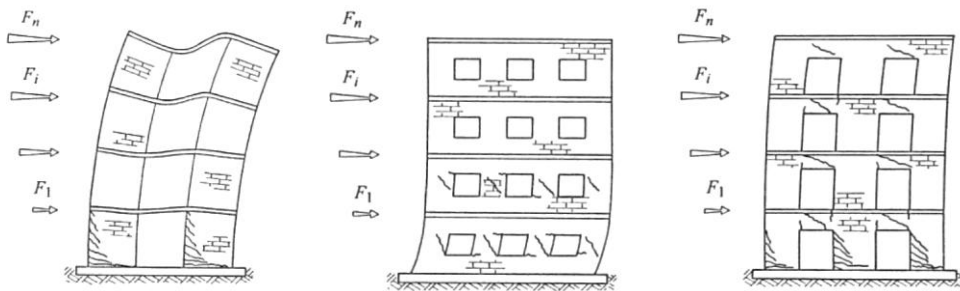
Cantilever walls linked by flexible floor slabs (left), coupled shear walls with weak piers (middle) and coupled shear walls with weak spandrels (right) (from Tomažević, 1999).
